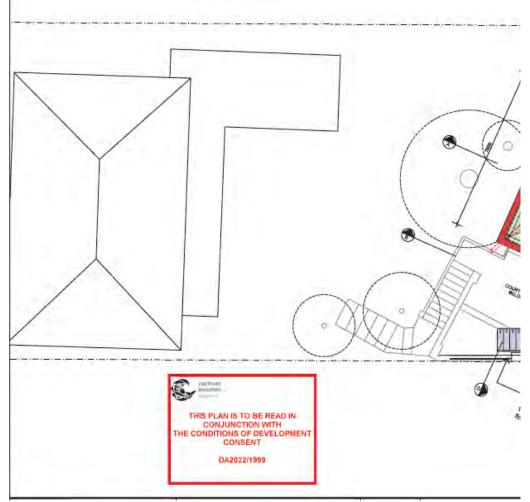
Note the existing and approved new stairs for No. 33 Amiens Road located on the common side boundary shared with the subject site (No. 31A Amiens Road).
